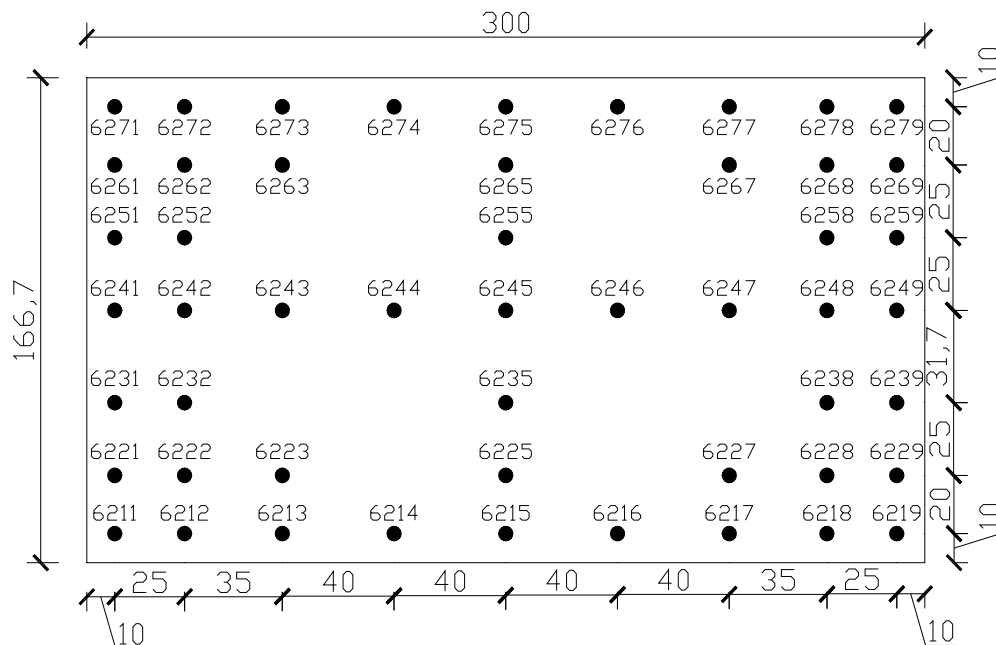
Pressure tap locations on the outer face of the elevated sheet clad scaffold
